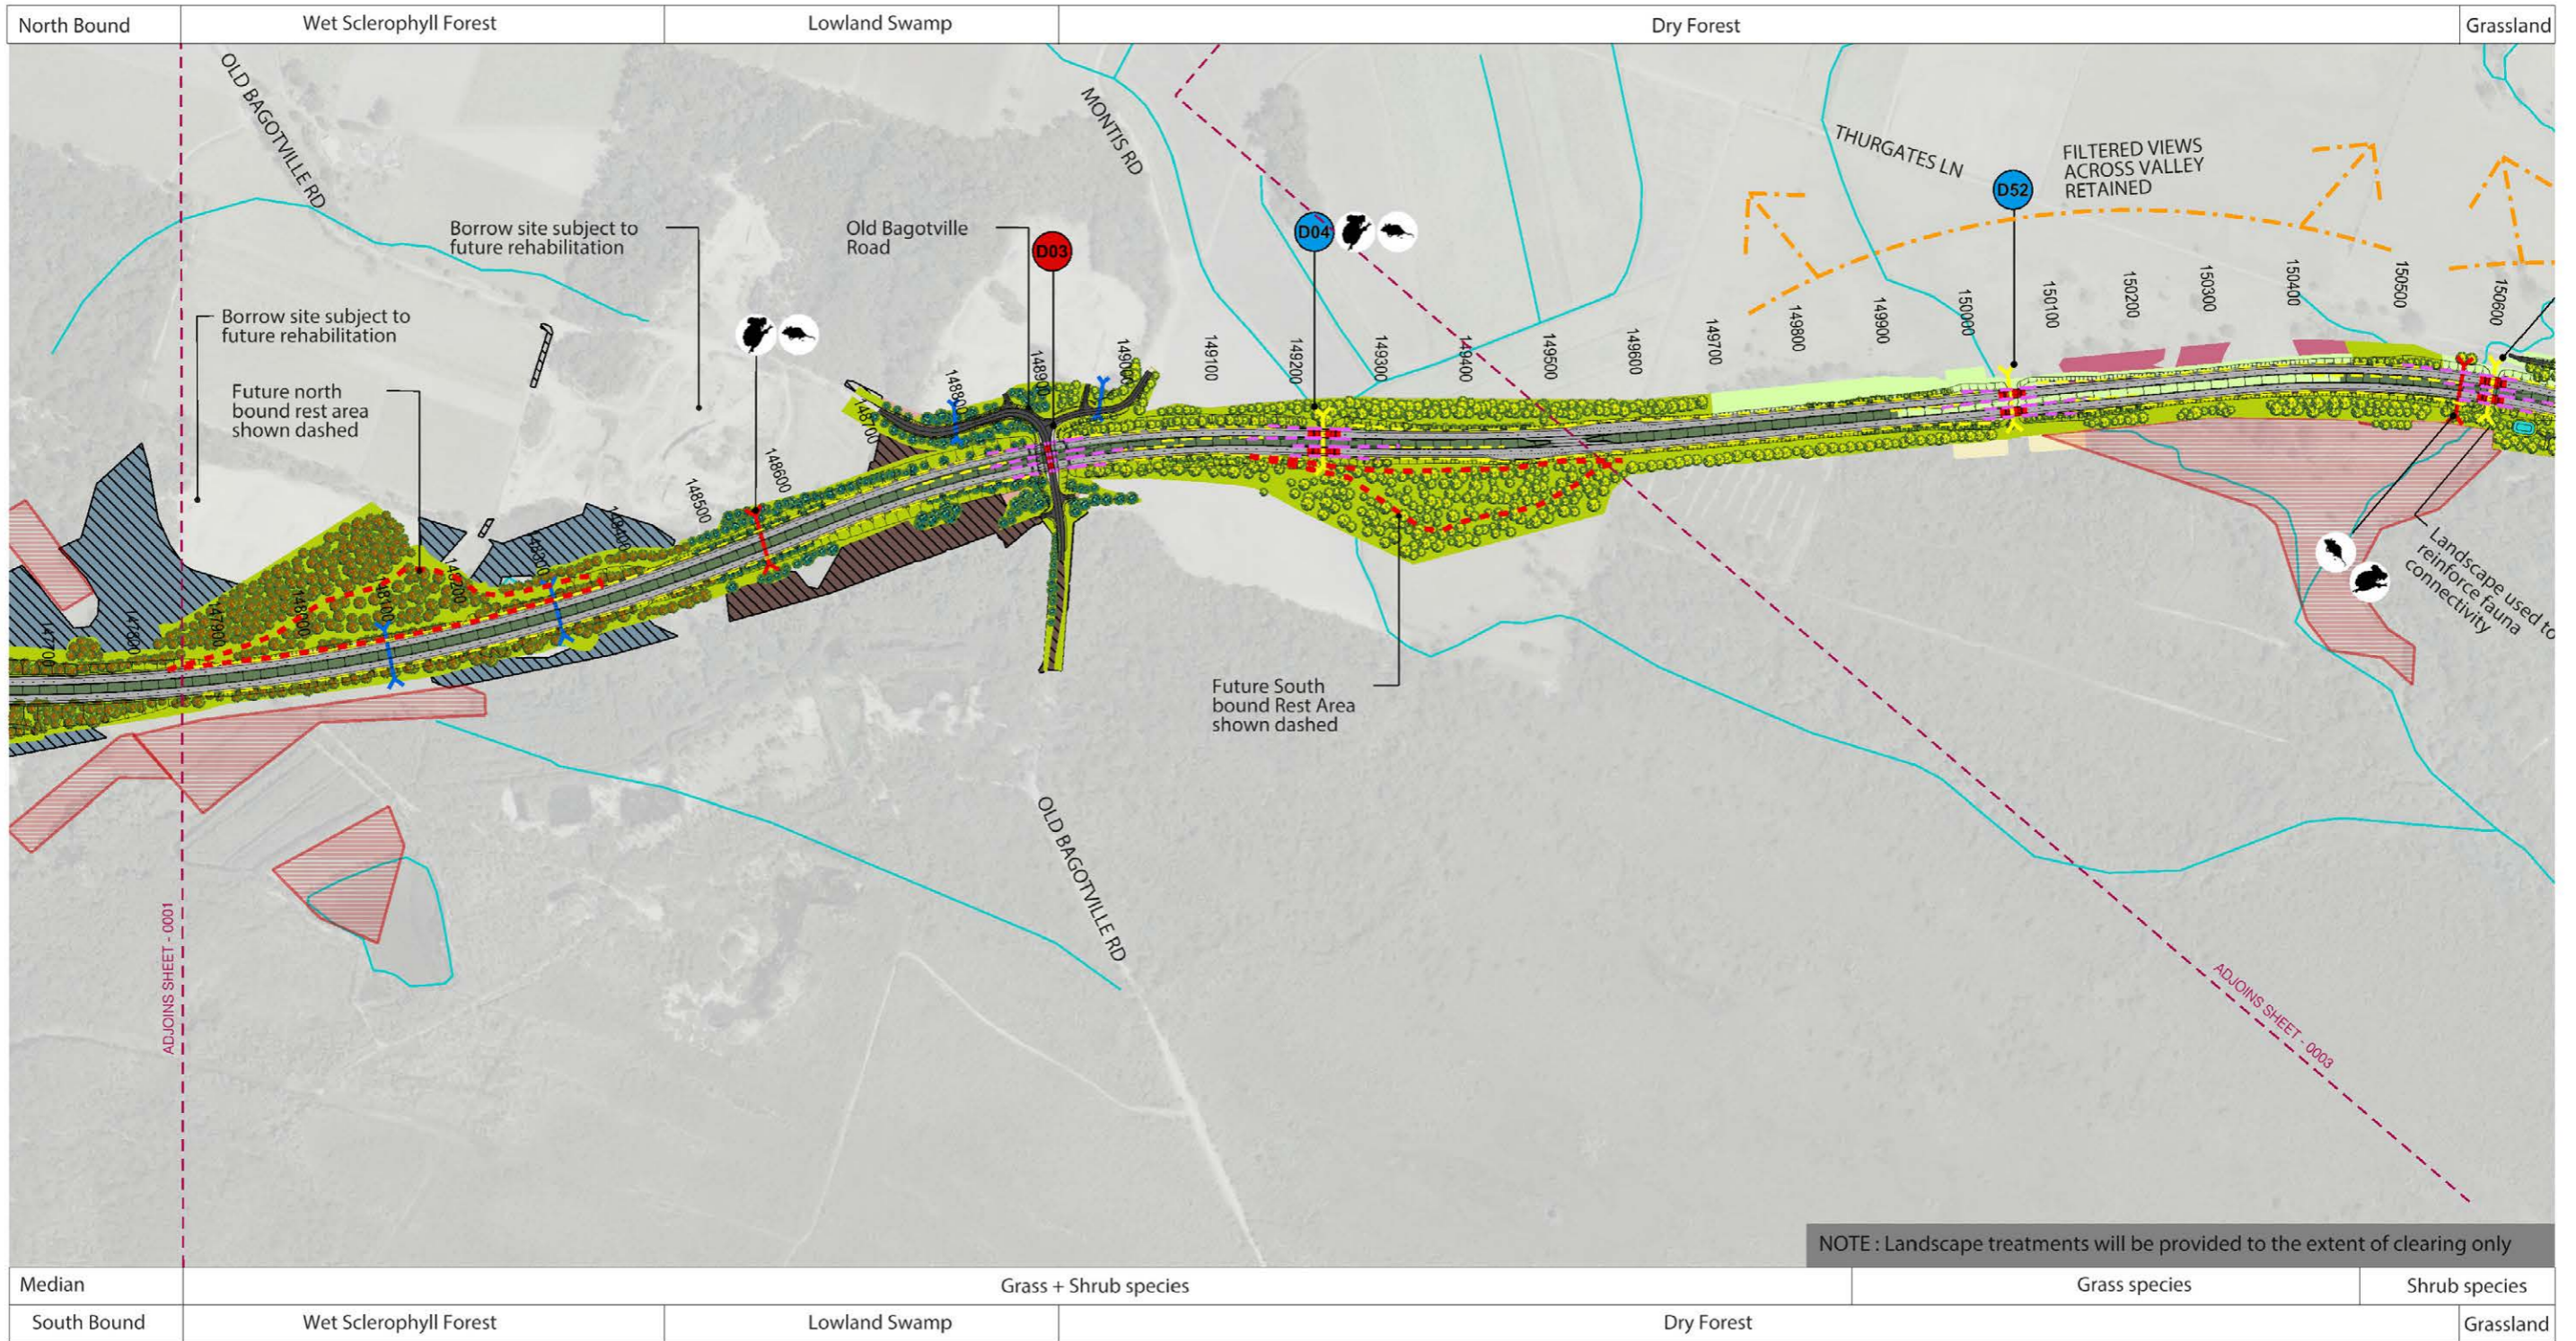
Strategy plan for Richmond River to Ballina (Sections 10 and 11)
